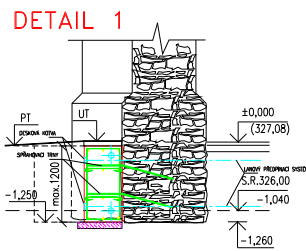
Location of Prestressing Cables in New Concrete Foundation which is Combined with Original Structure.
